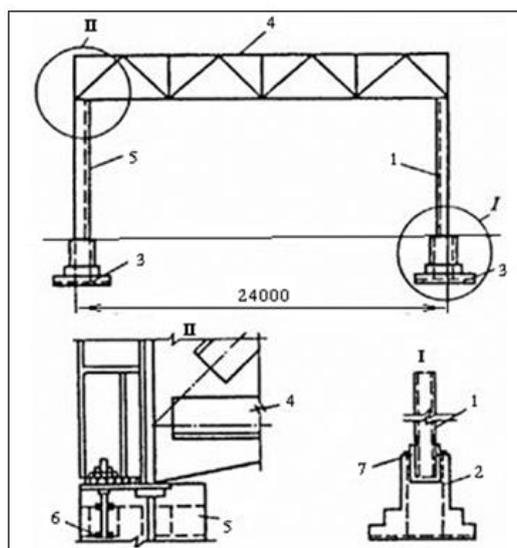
Protection of a Category I building using metal trusses (reinforcement used as conductor and grounding):
